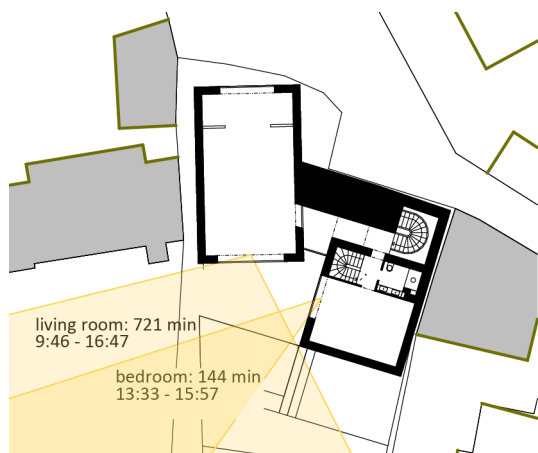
Family House Jinonice - sunlight duration on 1.3. in 2<sup>nd</sup> floor rooms (1:500) (source: author)
